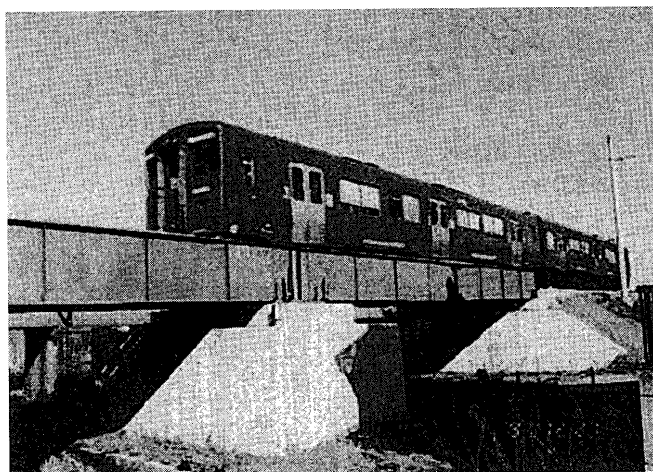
Completed bridge with a PLPS pier and a GRS abutment (27 December, 1997)
